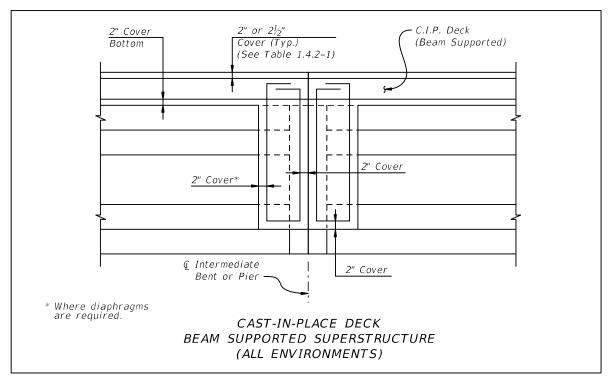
Cast-in-Place Deck / Beam Supported Superstructure (All environments)
